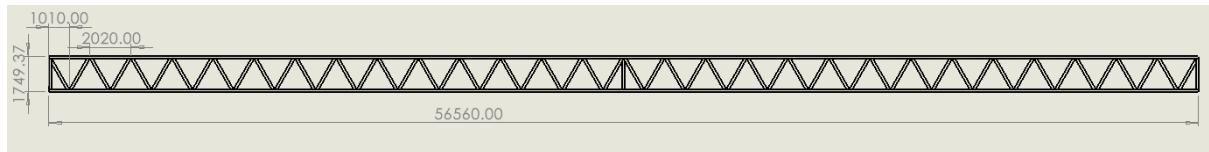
Engineering drawing of truss used in the platform deck (side angle)
